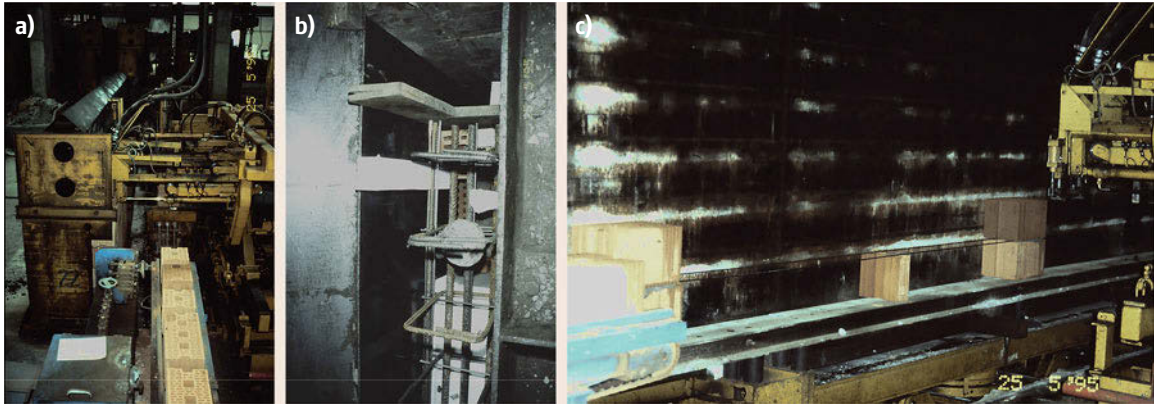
(a) Brickwork positioning; (b) brickwork alignment; (c) automated reinforcement (vertical) station
